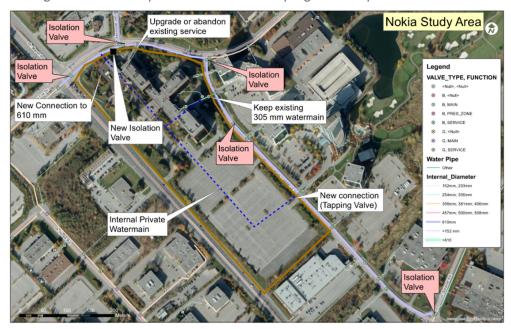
Conceptual Watermain Looping and Proposed Connection Points
